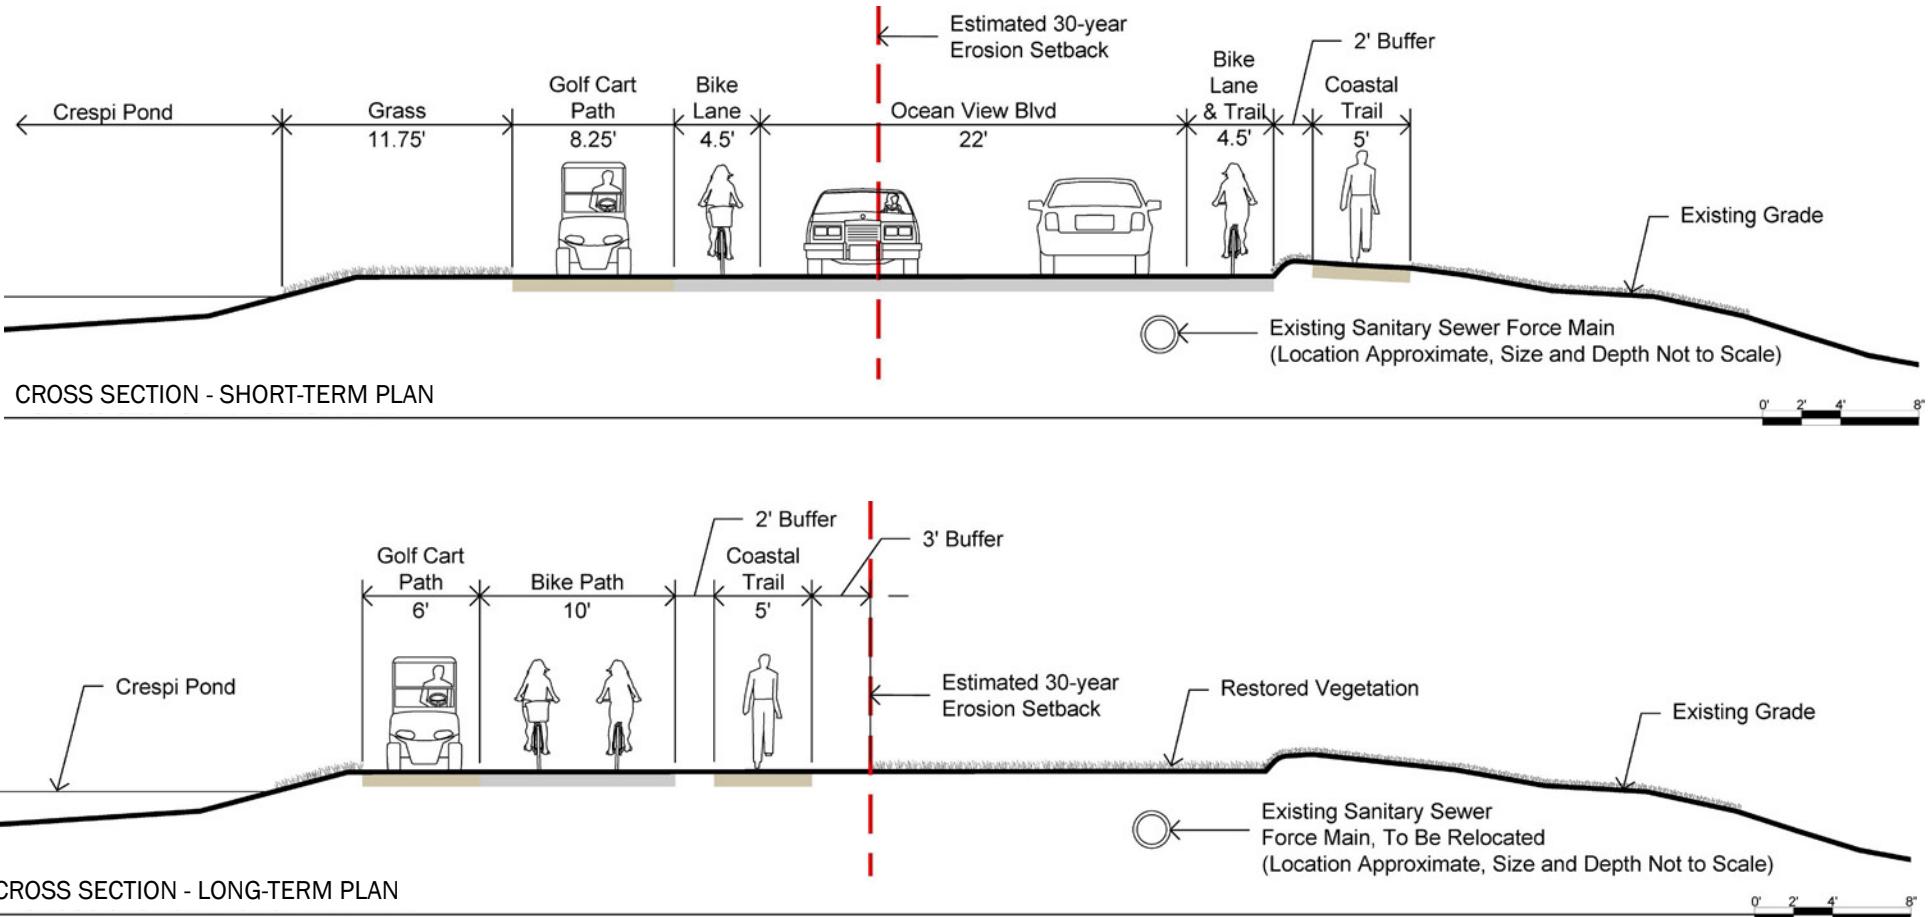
SHORT TERM AND LONG TERM CROSS SECTIONS AT CRESPI POND
